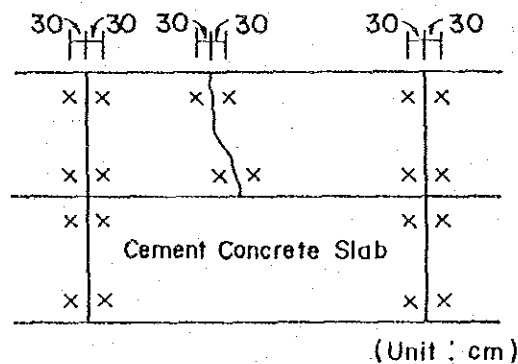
Measuring Points of Deflection Survey on Cement Concrete Pavement
